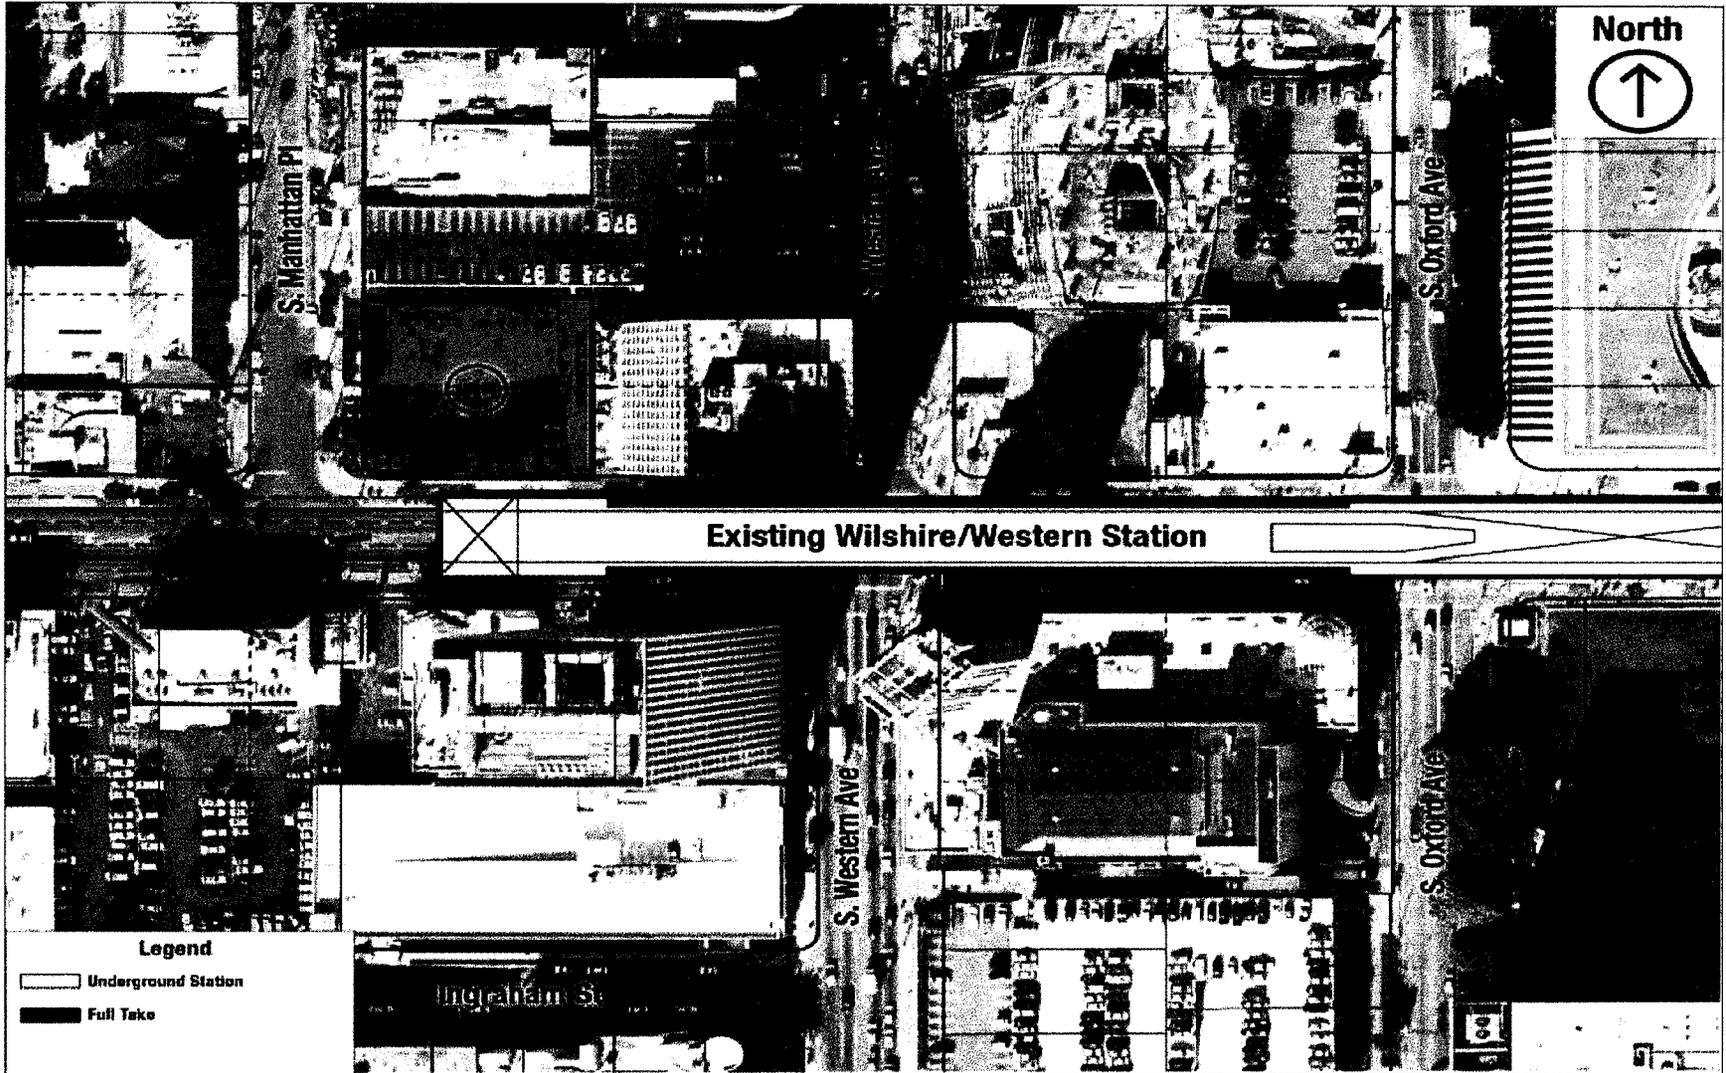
Wilshire/Western Station North Construction Staging Area Option
